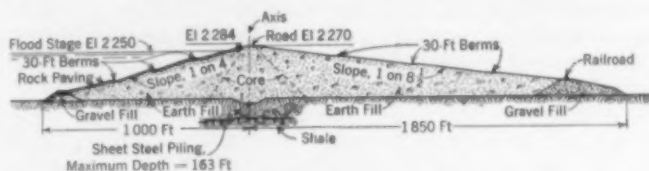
TYPICAL CROSS-SECTION OF FORT PECK DAM
